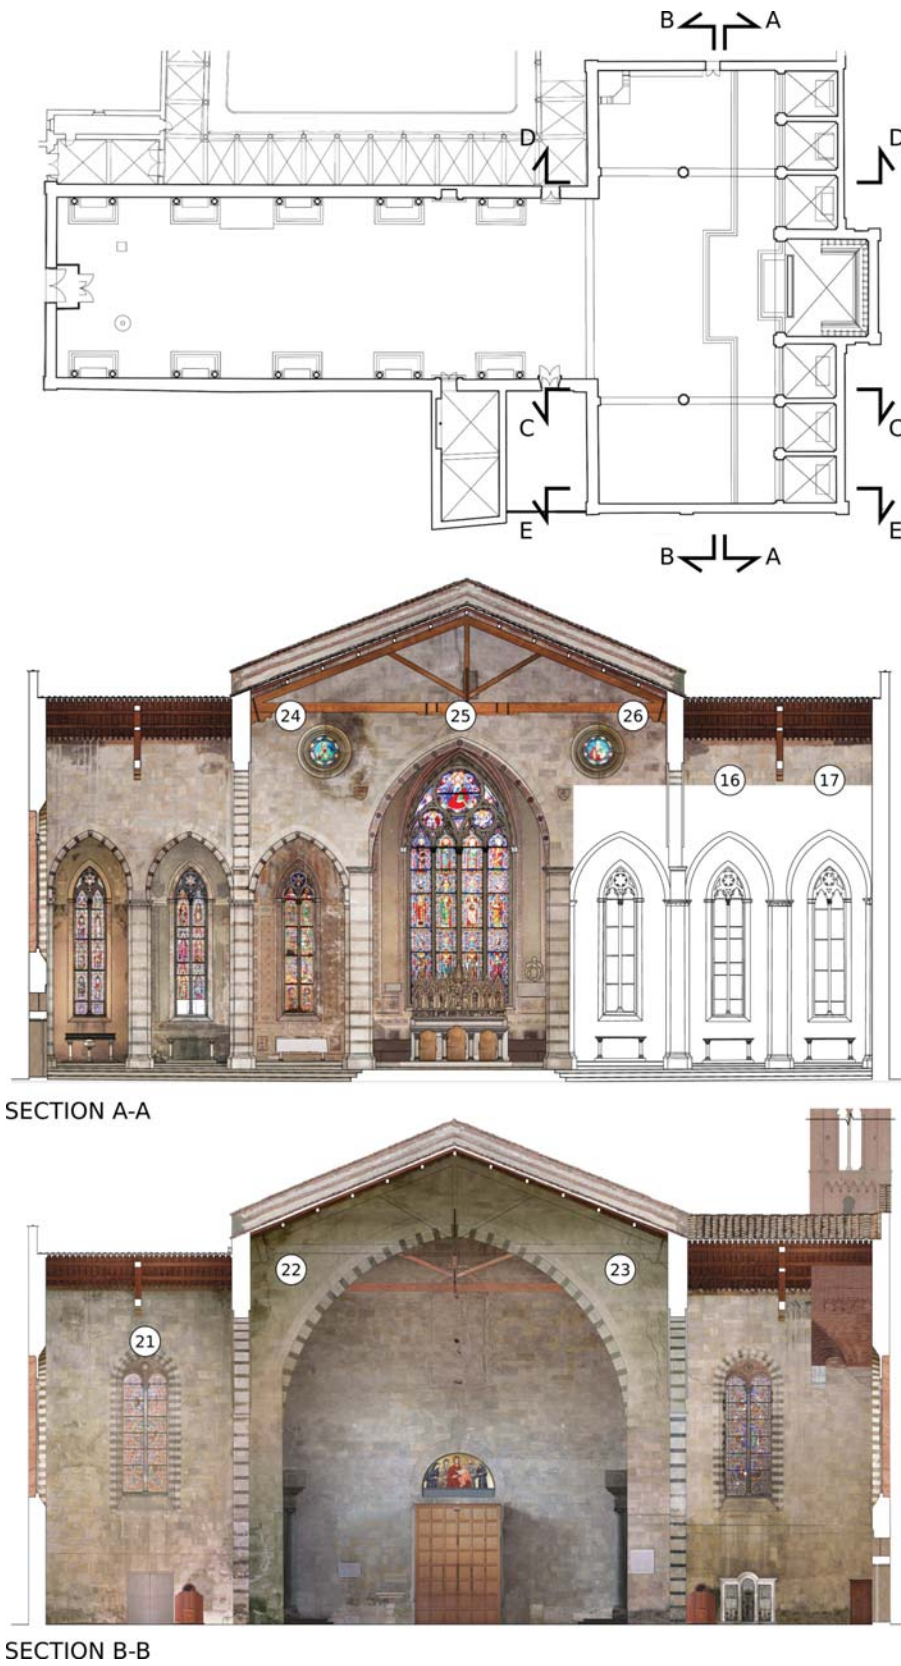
Sensor positioning. Church plan, section AA (east transept wall) and section BB (west transept wall). White portions were impossible to photograph.
